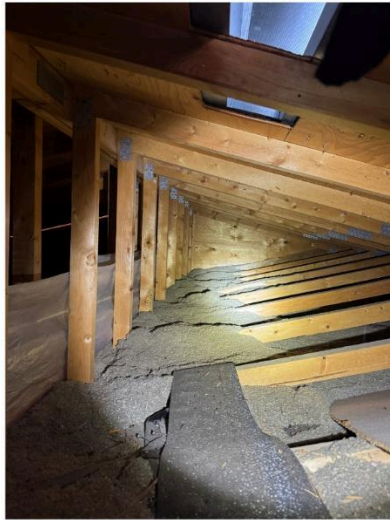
Standard attic build up with minimal insulation. Leaks were repaired and blow-in wood fibre to be added.
